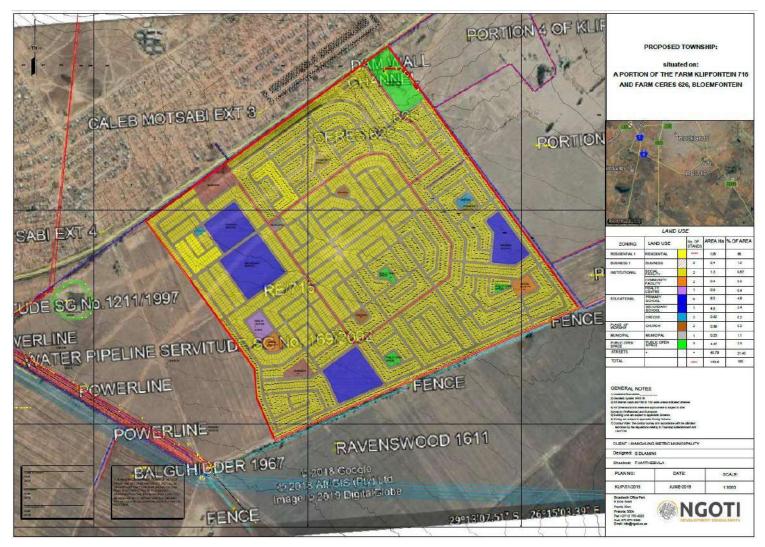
Proposed layout of the township development. Map provided by Inaluk Consulting Services
